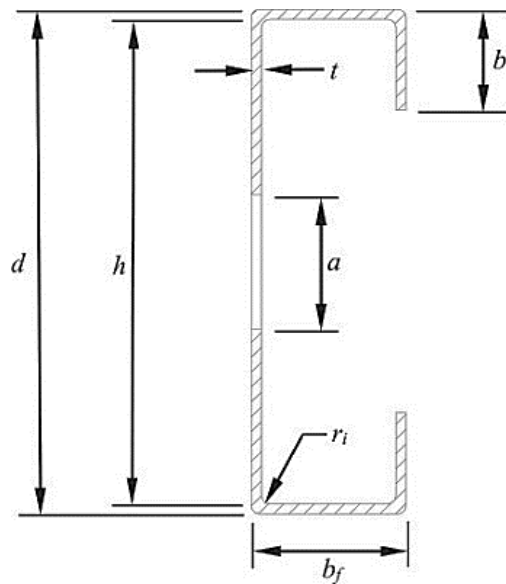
Section symbols in cross section of a cold-formed Lipped channel steel section.
